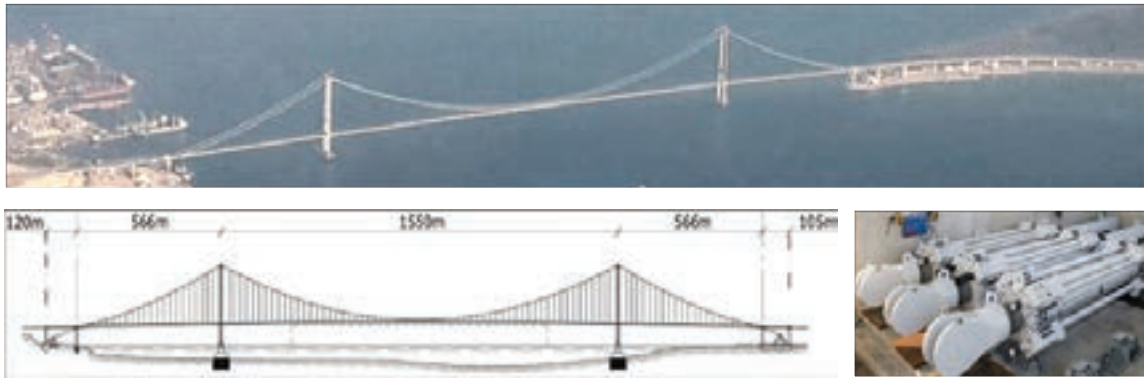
General layout of Osmangazi Suspension Bridge and the viscous dampers used
